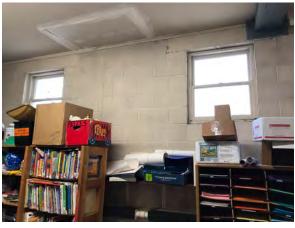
View west in Room 015, showing windows and cut out section of ceiling.
